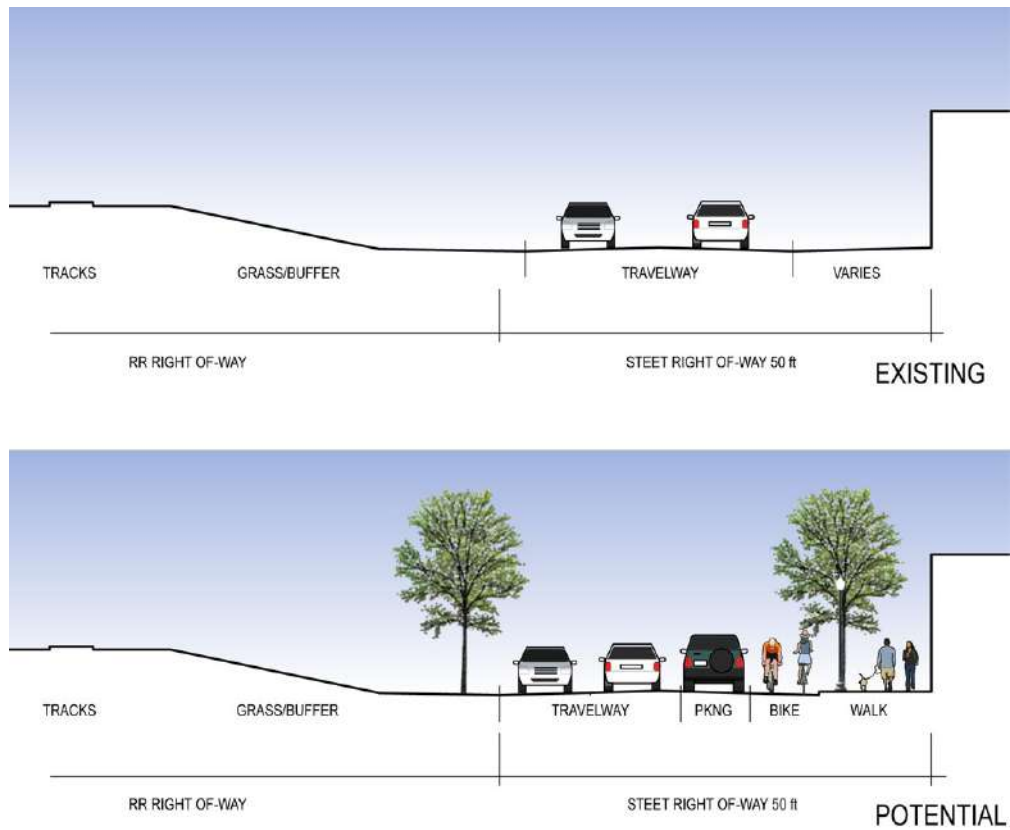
Downtown Irondale Recommendations – Potential First Avenue South Street Section of the block by City Hall
